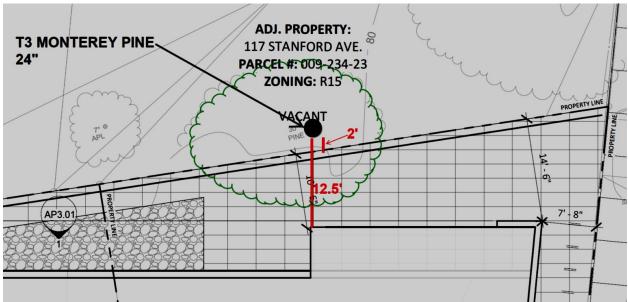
Tree T3, Monterey pine, and distance to building foundation and property line.
